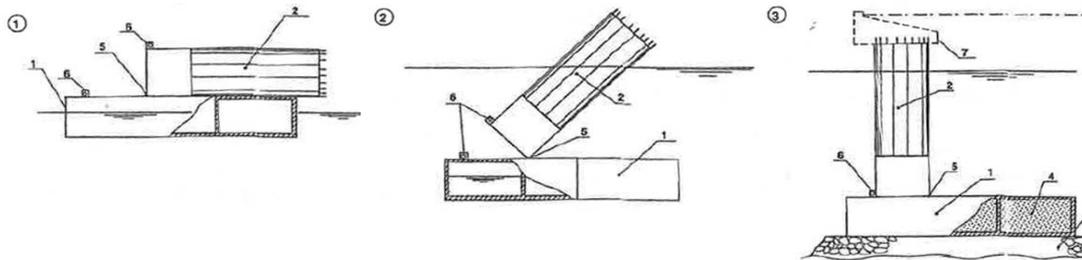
Installation phases of an segmented L-shaped caisson (after Tsinker (1958/1994))
